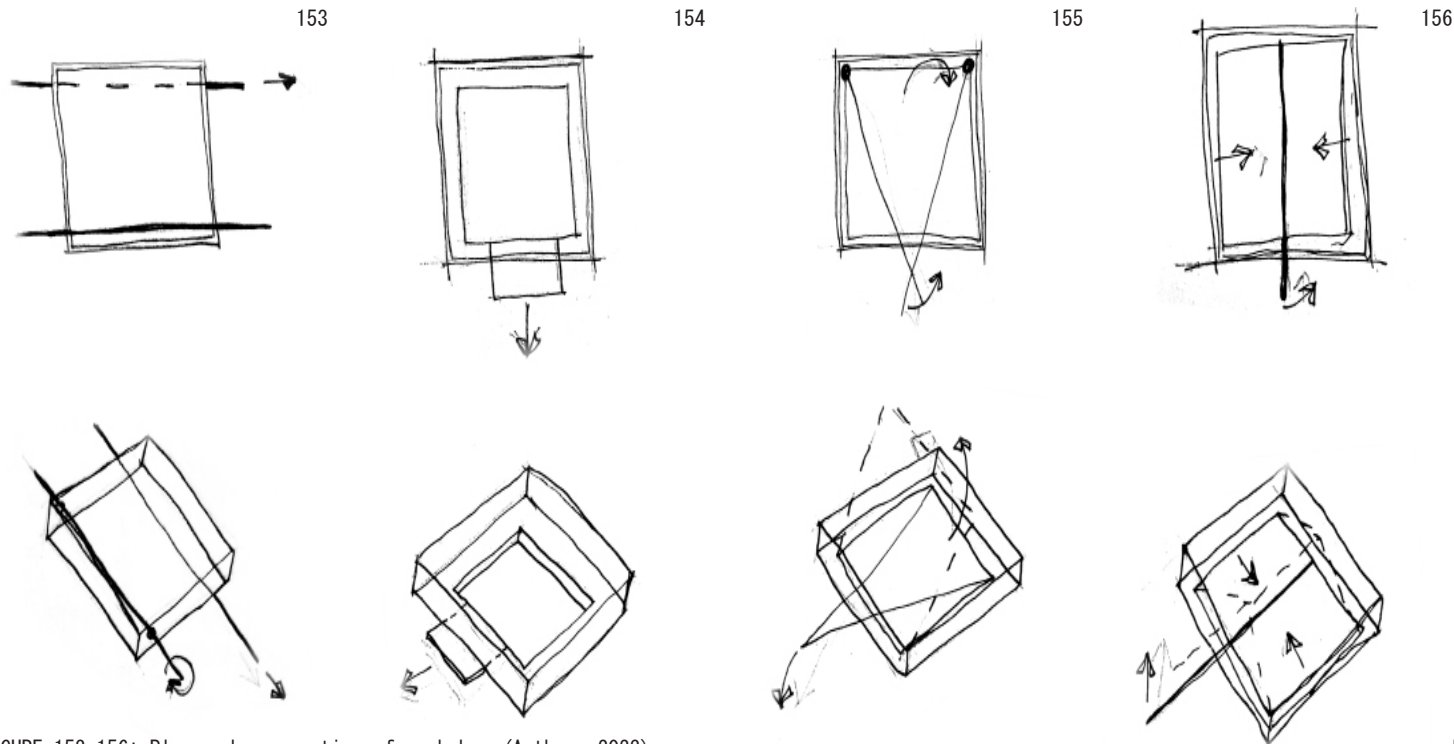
Plan and perspective of each box (Author, 2023).
